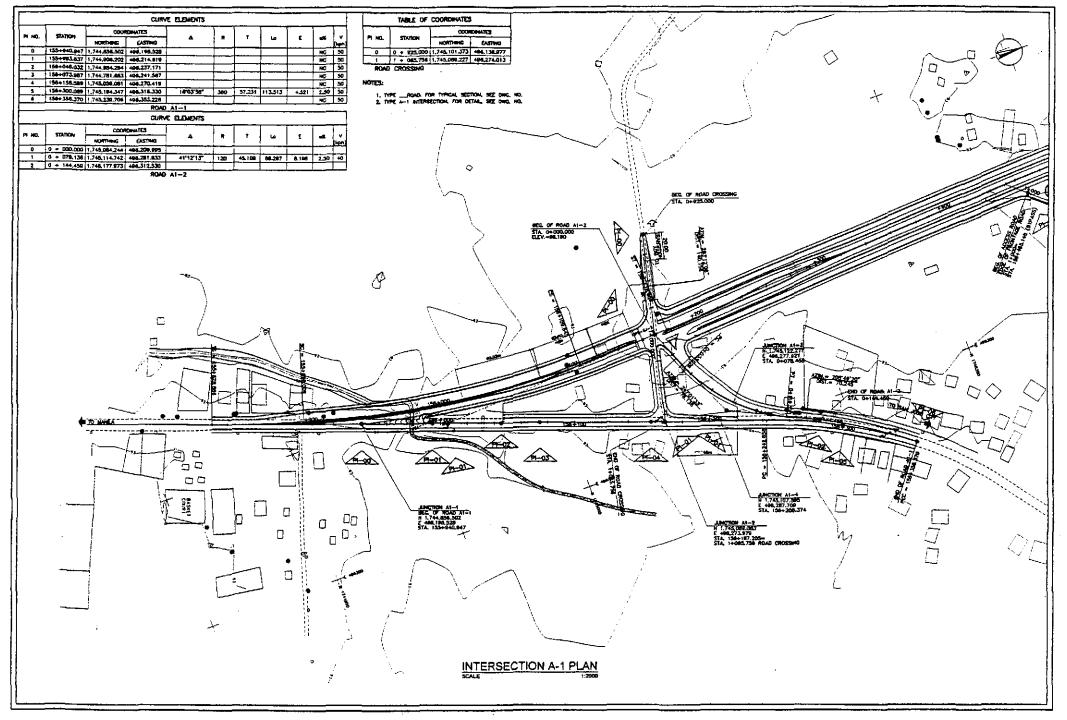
PLAN OF RECOMMENDED SCHEME
